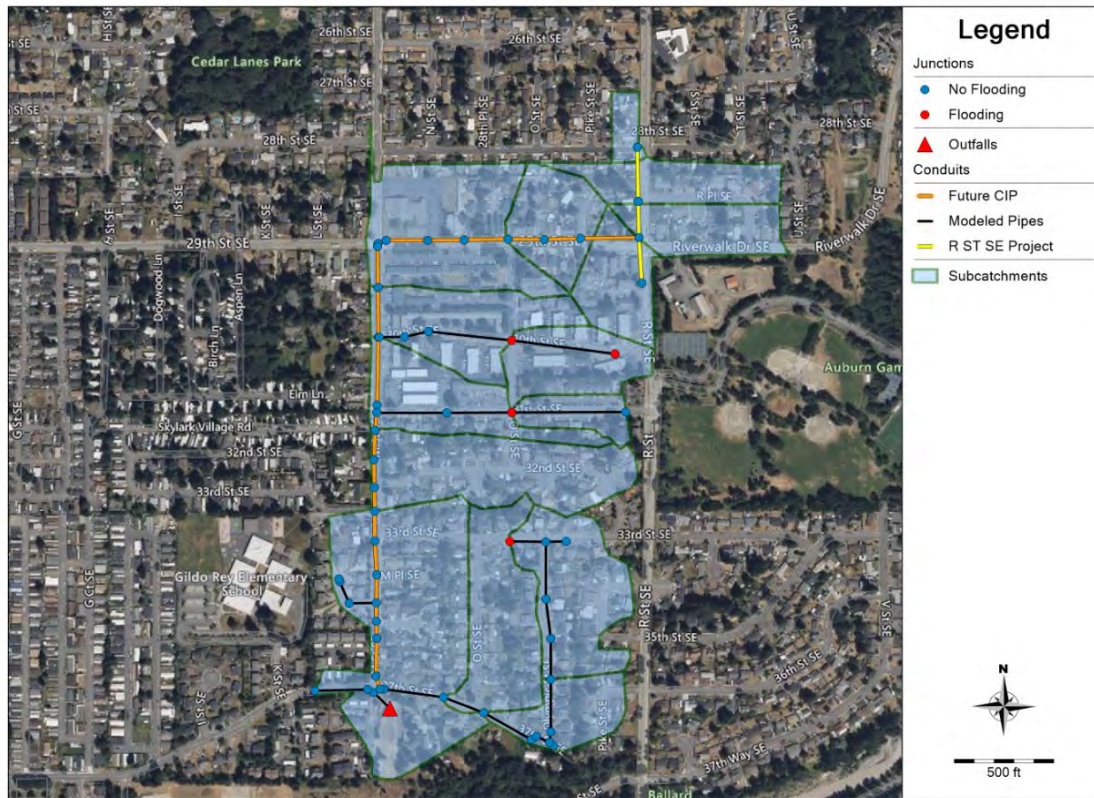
Plan View of R Street SE Widening and Future CIP (AZ Subbasin Model, 25-year storm flows [9/7/2019])
